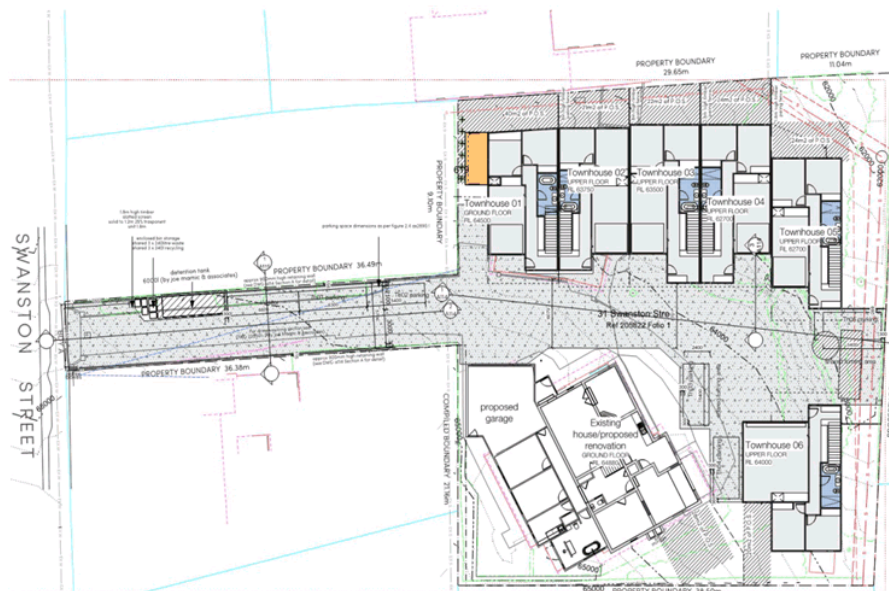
Site plan illustrating proposed multiple dwellings and parking areas
